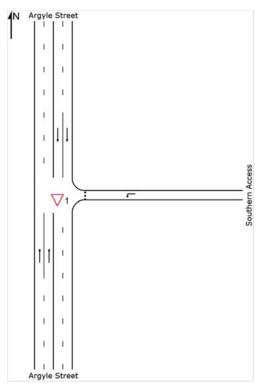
Southern Access and Argyle Street Intersection – Potential Layout
